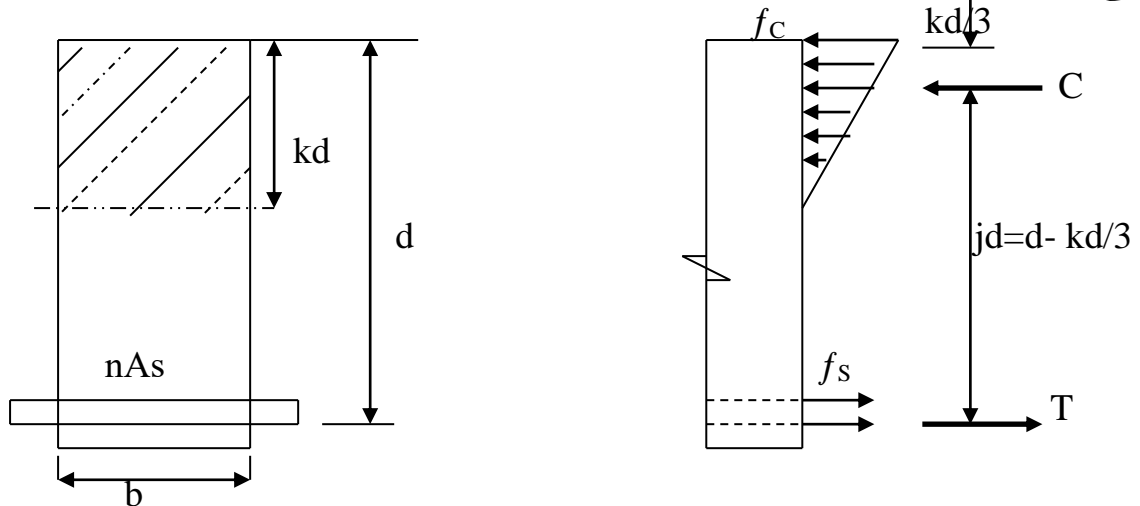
cracked transformed section [After Nilson et al. 2004]
